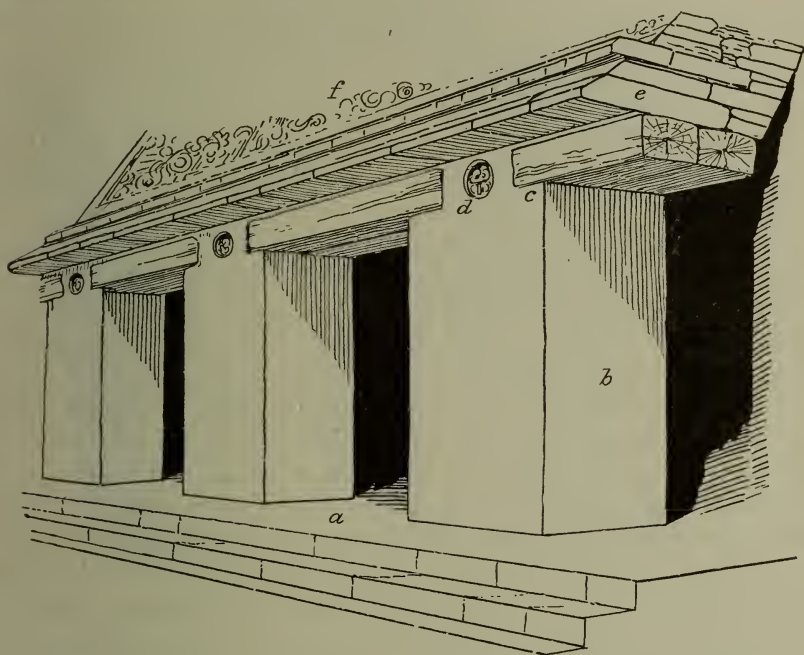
EXTERIOR DOORWAYS AND PIERS WITH WOODEN LINTELS (RESTORED).
